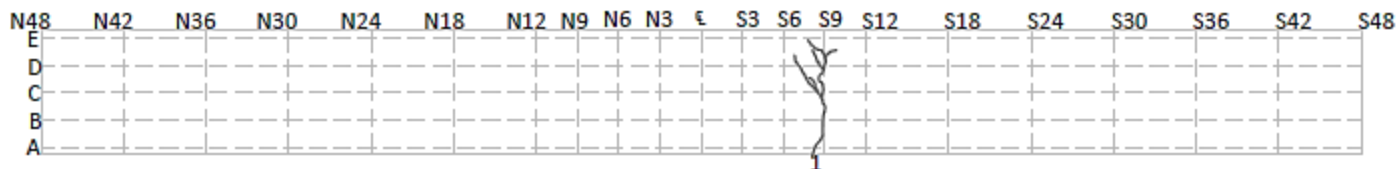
Branching Cracks of Specimens without Steel Reinforcement at 0.8 in
